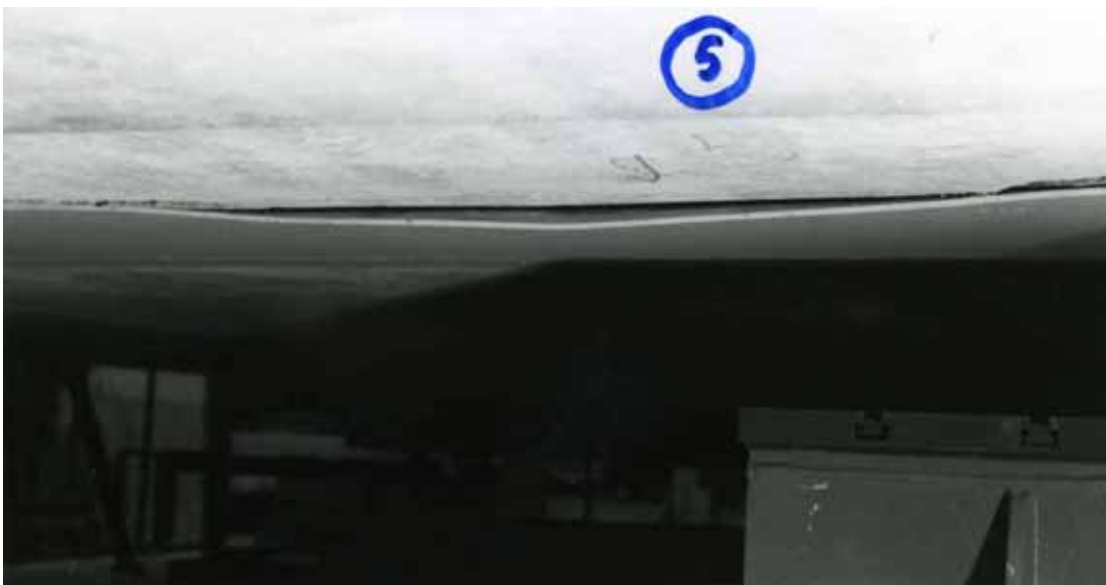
Deformation of ledge of Delta-beam under slab unit 5 after failure of the floor.
